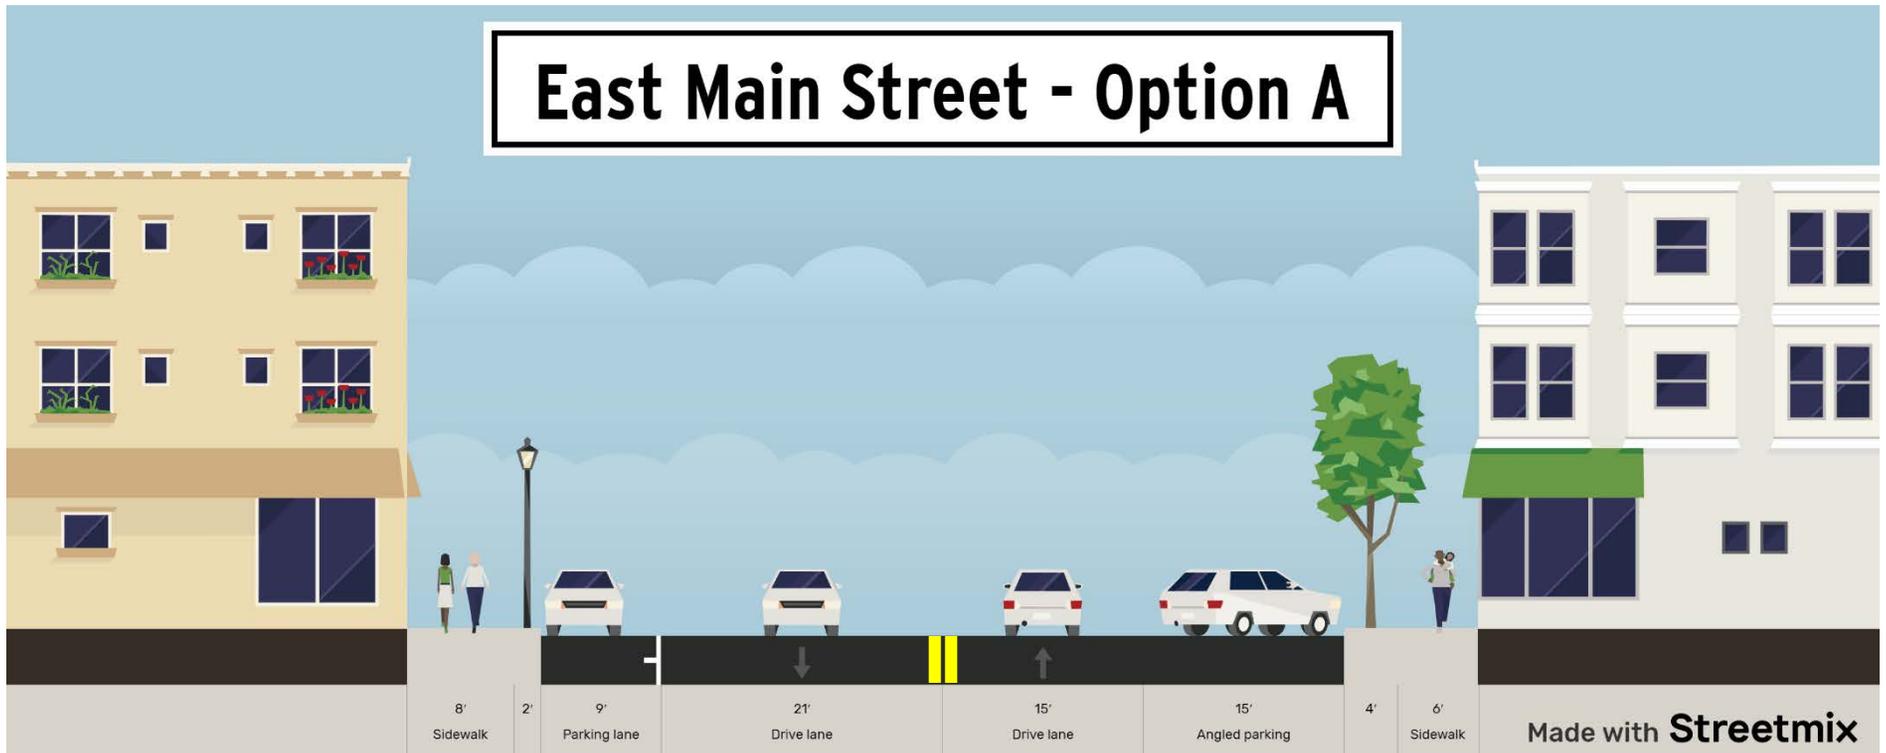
Existing East Main Street Section for Block 21 (View East)
